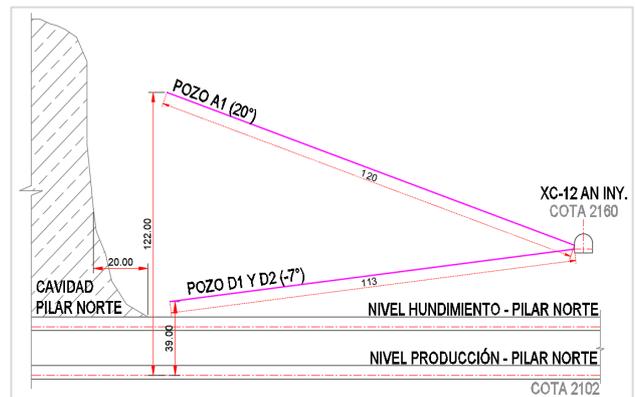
Instrumentation Design for Caving Monitoring, Pilar Norte Mine.
